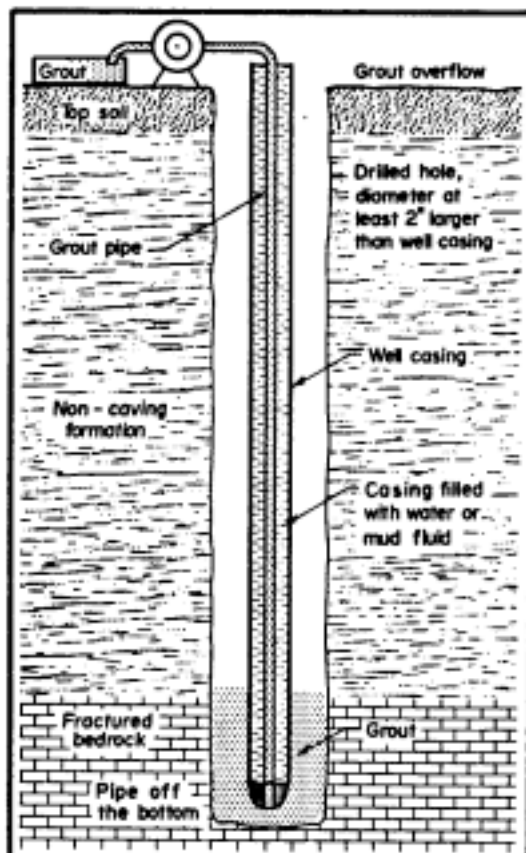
Grout Installation by Continuous Injection Method: Grout pipe placed inside the casing is connected to a drillable plug or float shoe at the bottom of the casing. (Johnson, 1966)
